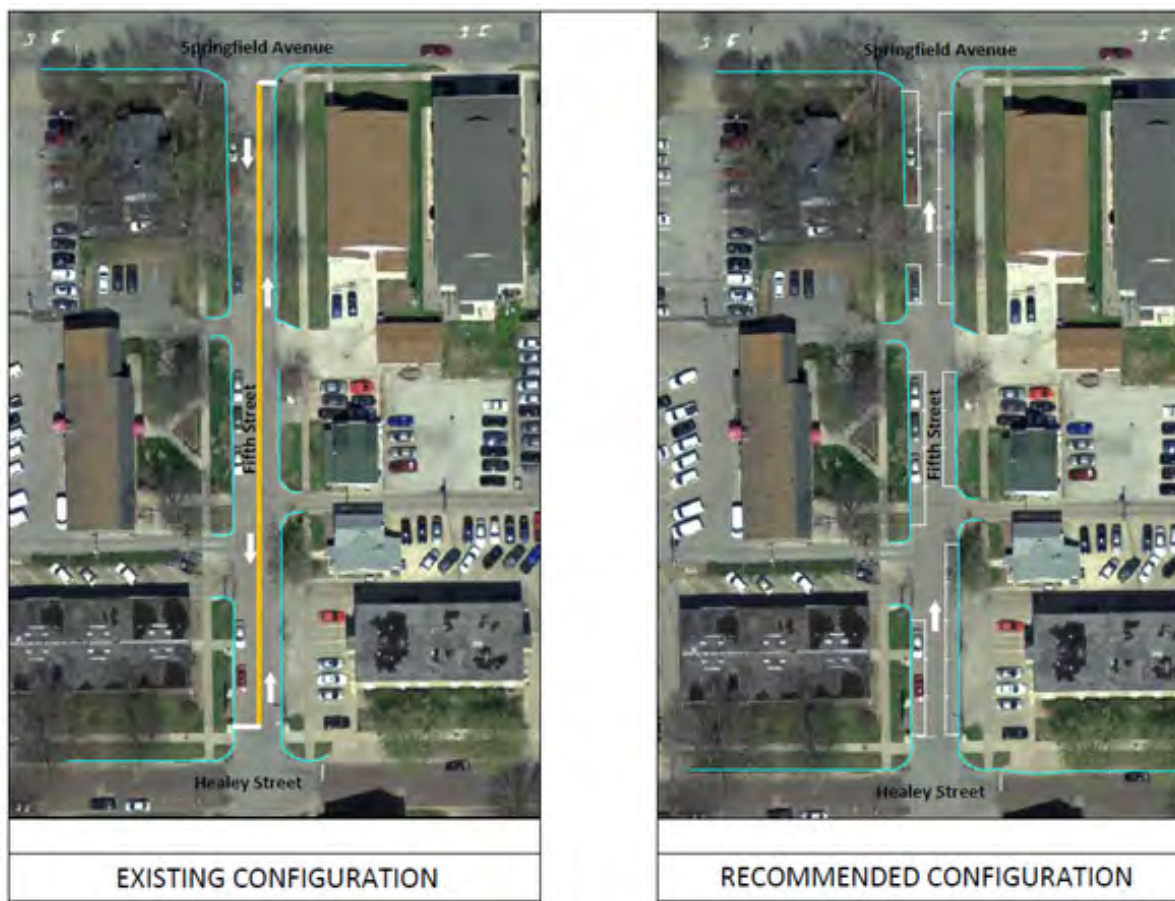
Existing and Proposed Lane Configurations for Fifth Street North of Green Street
